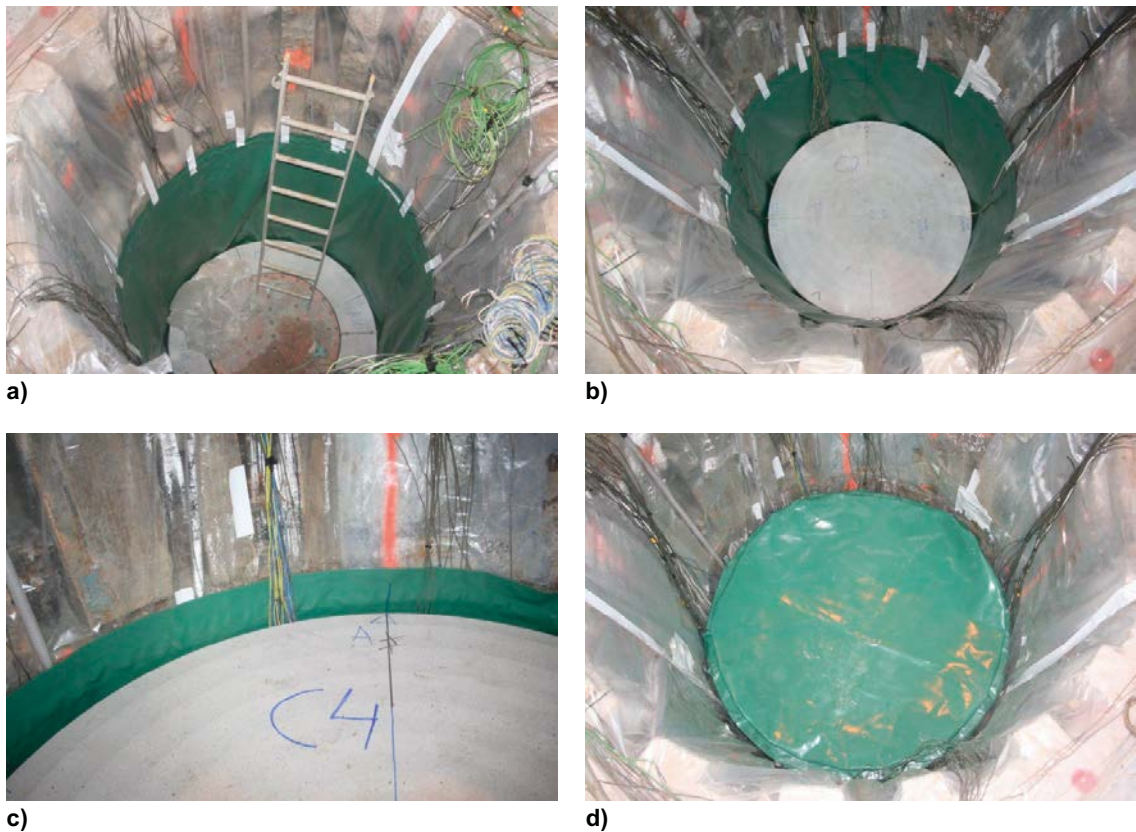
Installation of the protection tube in the deposition hole a) the tube is in place b) block C2 inside the protection tube c) block C4 in place inside the protection tube d) a sheet placed on top of block C4.
